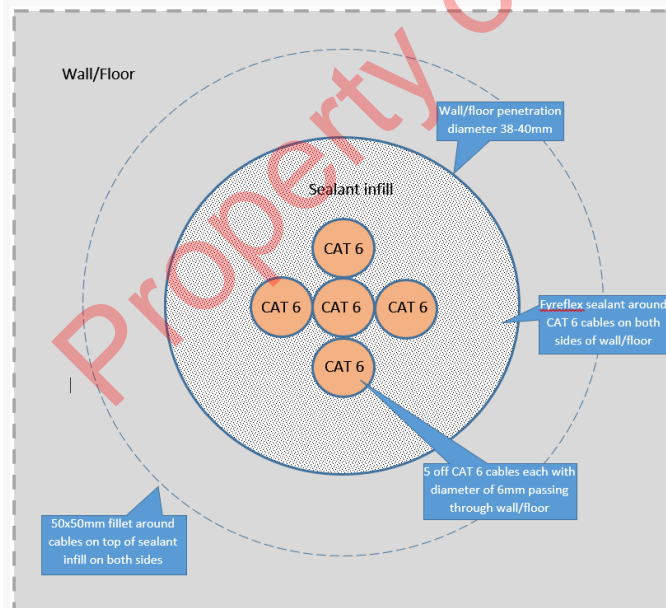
Cable Penetration in Masonry Partitions - Face Sectional View
